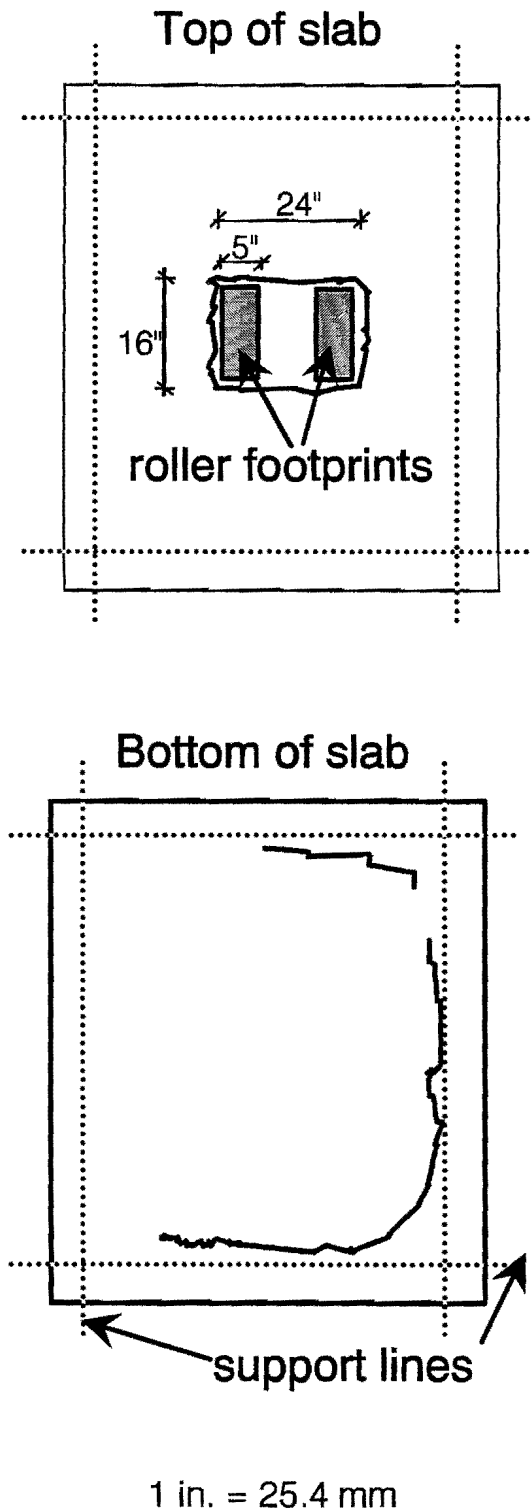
Plan view of top and bottom of slab, showing cracking patterns after punching shear failure
